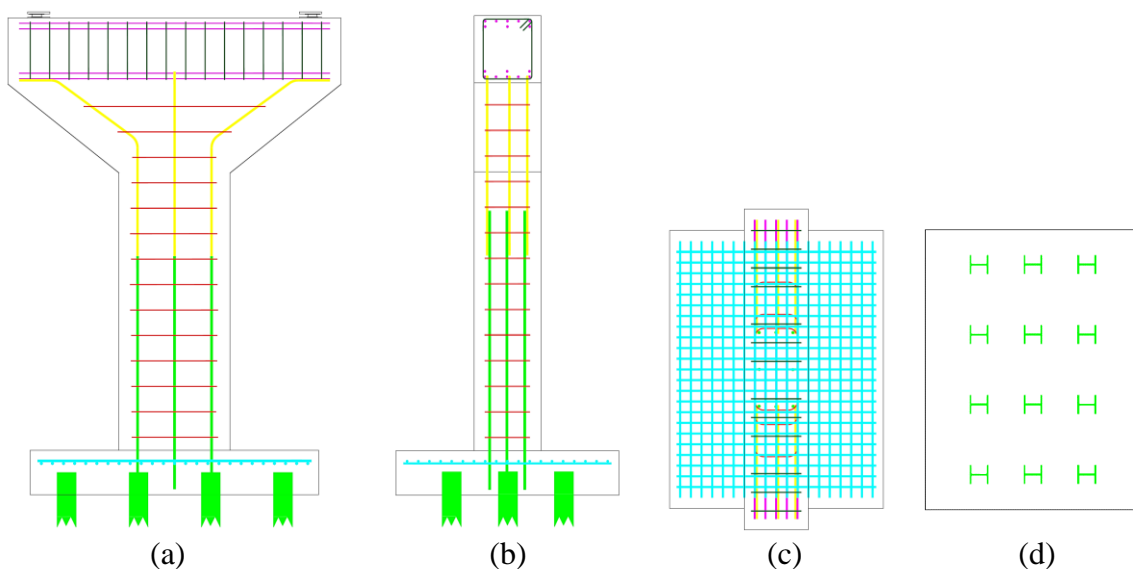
(a) Pier cross section; (b) profile view; (c) plan view; (d) pile cap plan view.
